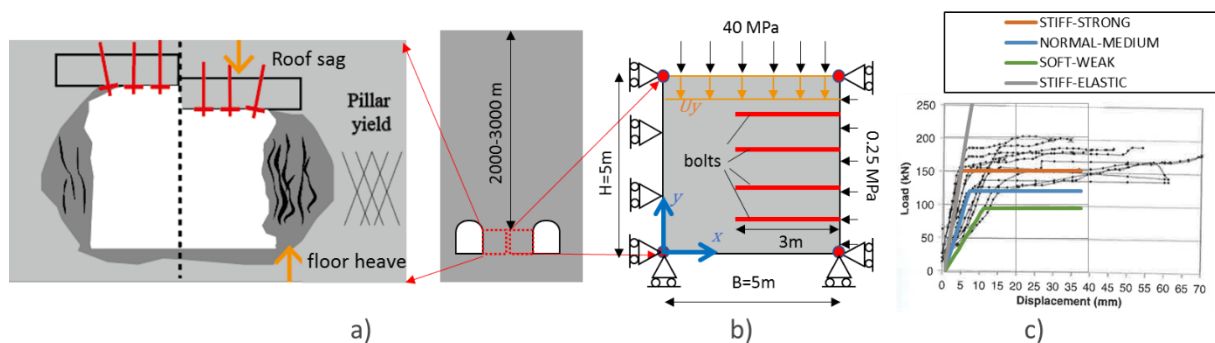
a) Deep mine tunnel configuration including the illustration of mining-induced tangential straining of drift wall due to floor heave or roof sag (roof loading or pillar yield) adapted from [2], b) FEM model geometry and boundary conditions and c) bolt typology analysed against pull-out tests done in the field at LaRonde on hybrid bolts [17].
